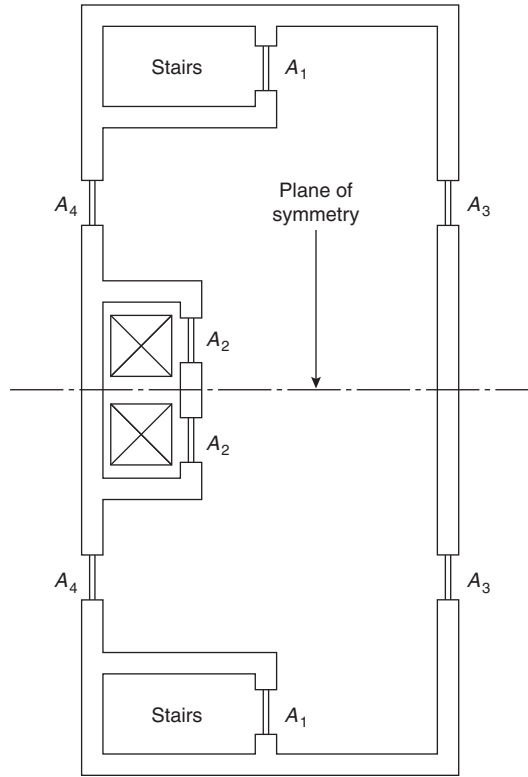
Building floor plan illustrating symmetry concept.
